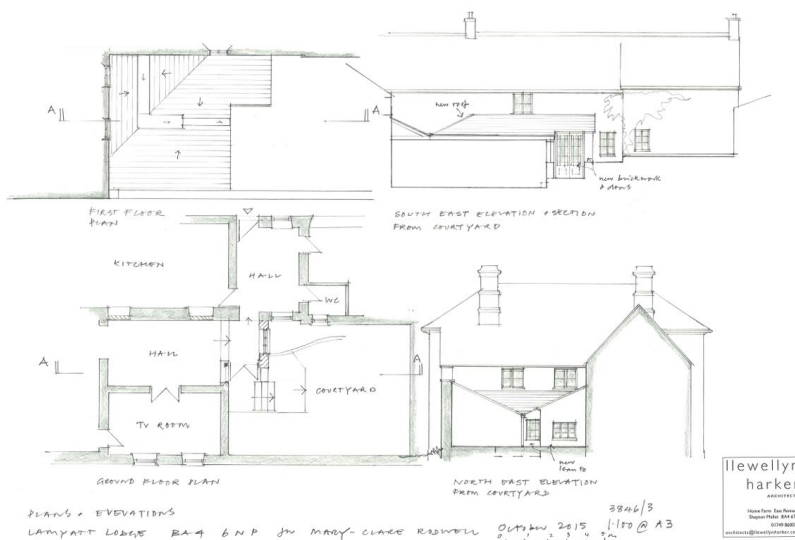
Proposed plans and elevations from 2015/2689/LBC and 2015/2688/HSE
